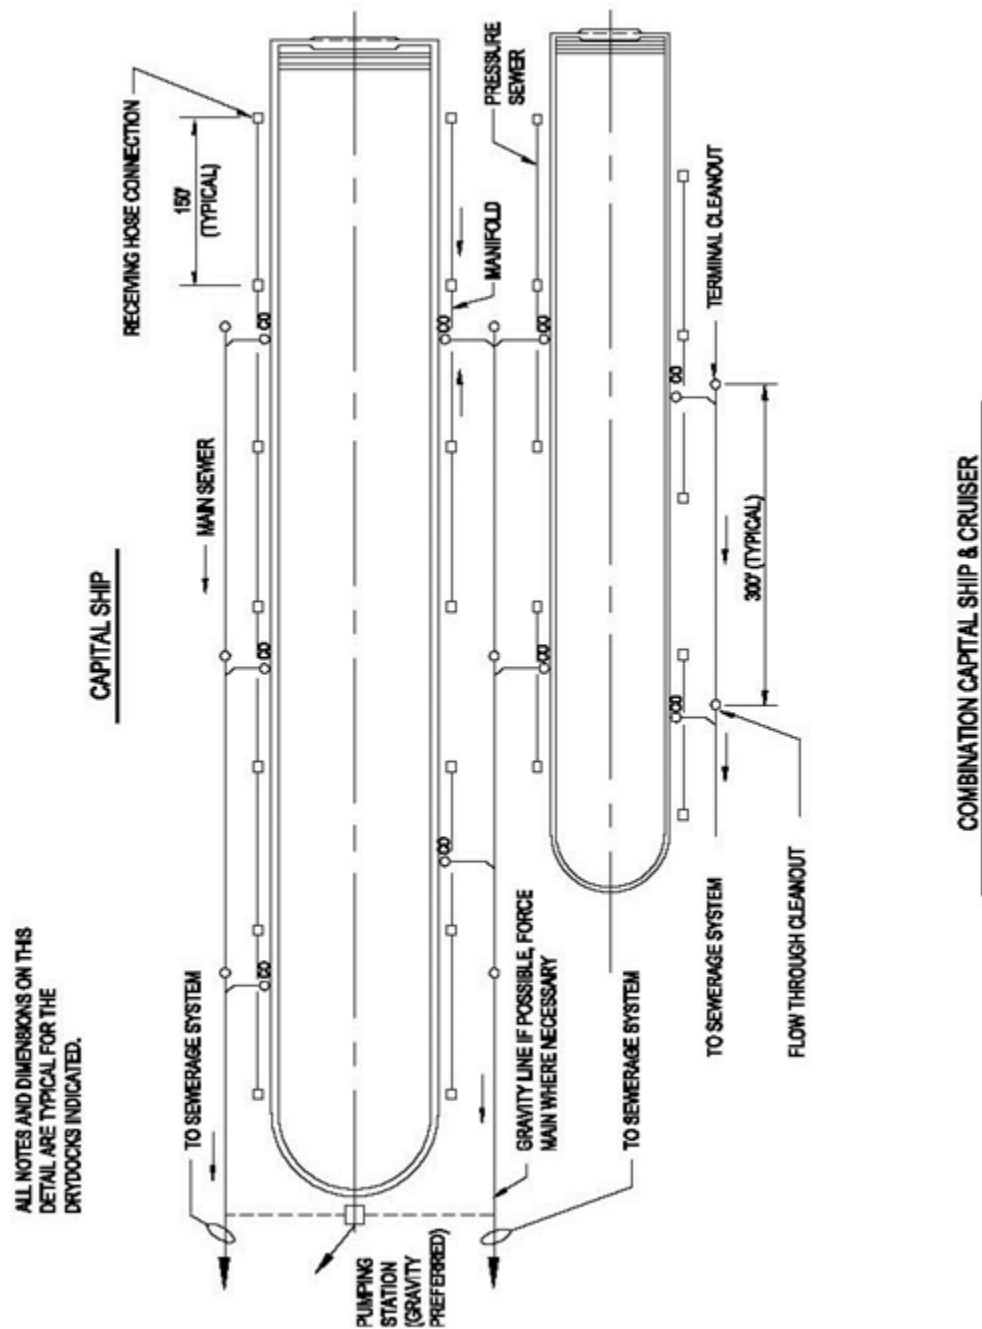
(a) Underground Hose Connection (1 of 2)
